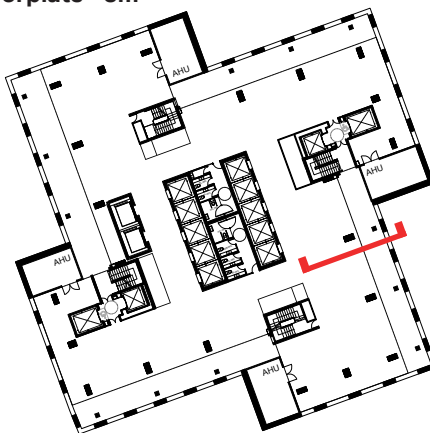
Floorplate layouts and sections assessed for daylighting studies
